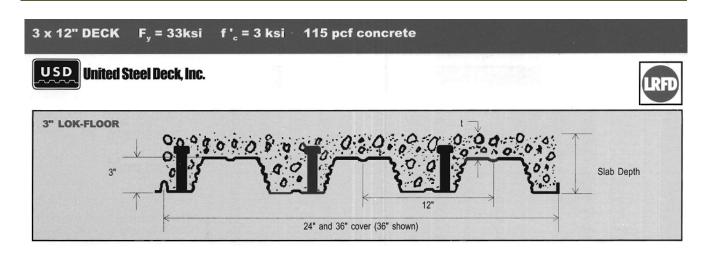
Composite steel decking used for existing floor design & non composite beam floor design.
